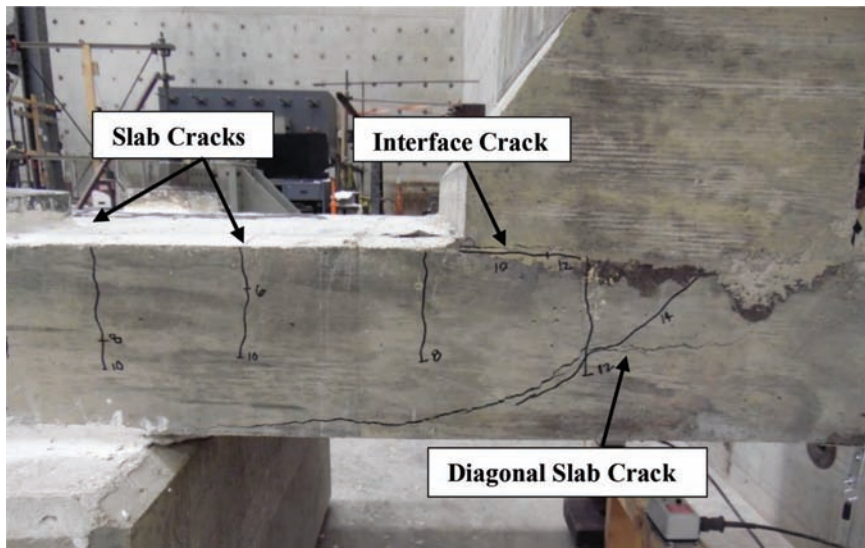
Strip Specimen 1 cracking at 14 kip.
